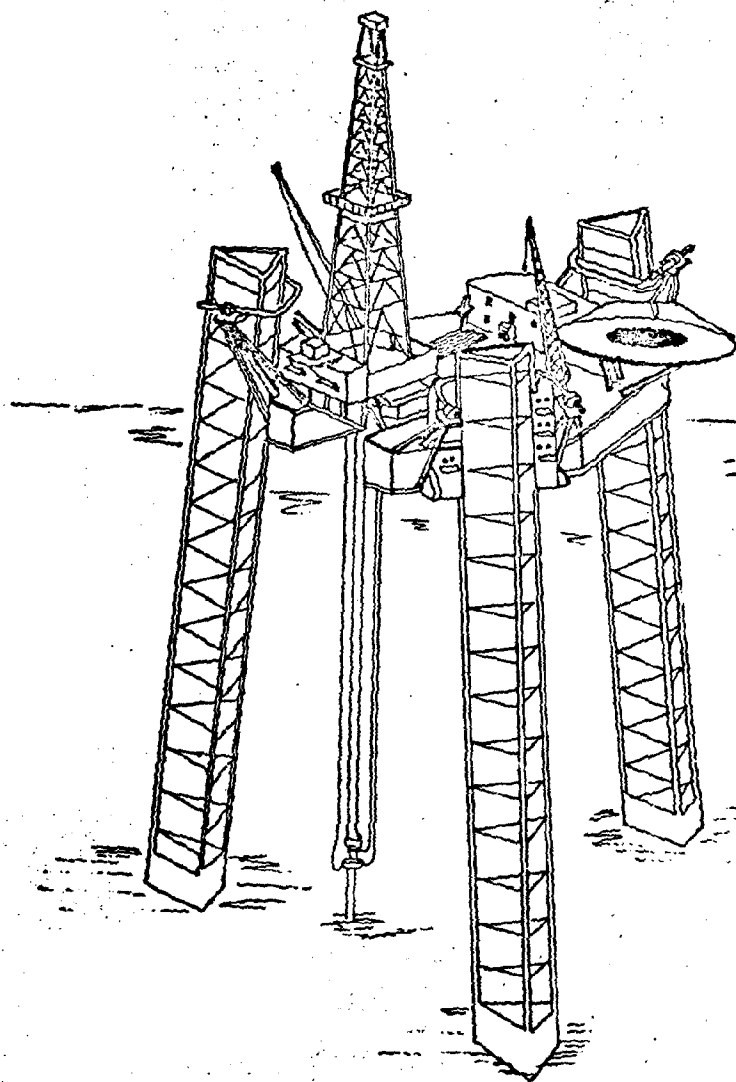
Jack-up type oil drilling platform. (Adapted from Marks and Kim [7].)
